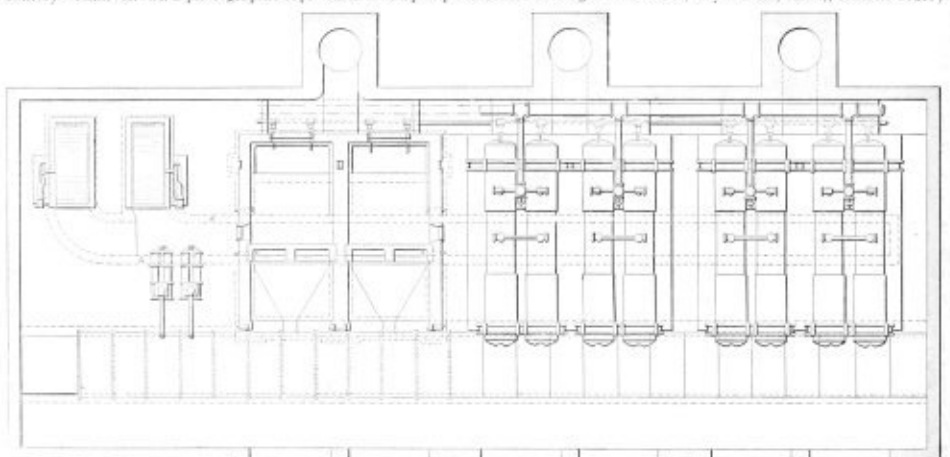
PLAN OF BOILER PLANT, HAZLETON NO. 1 COLLIERY.
